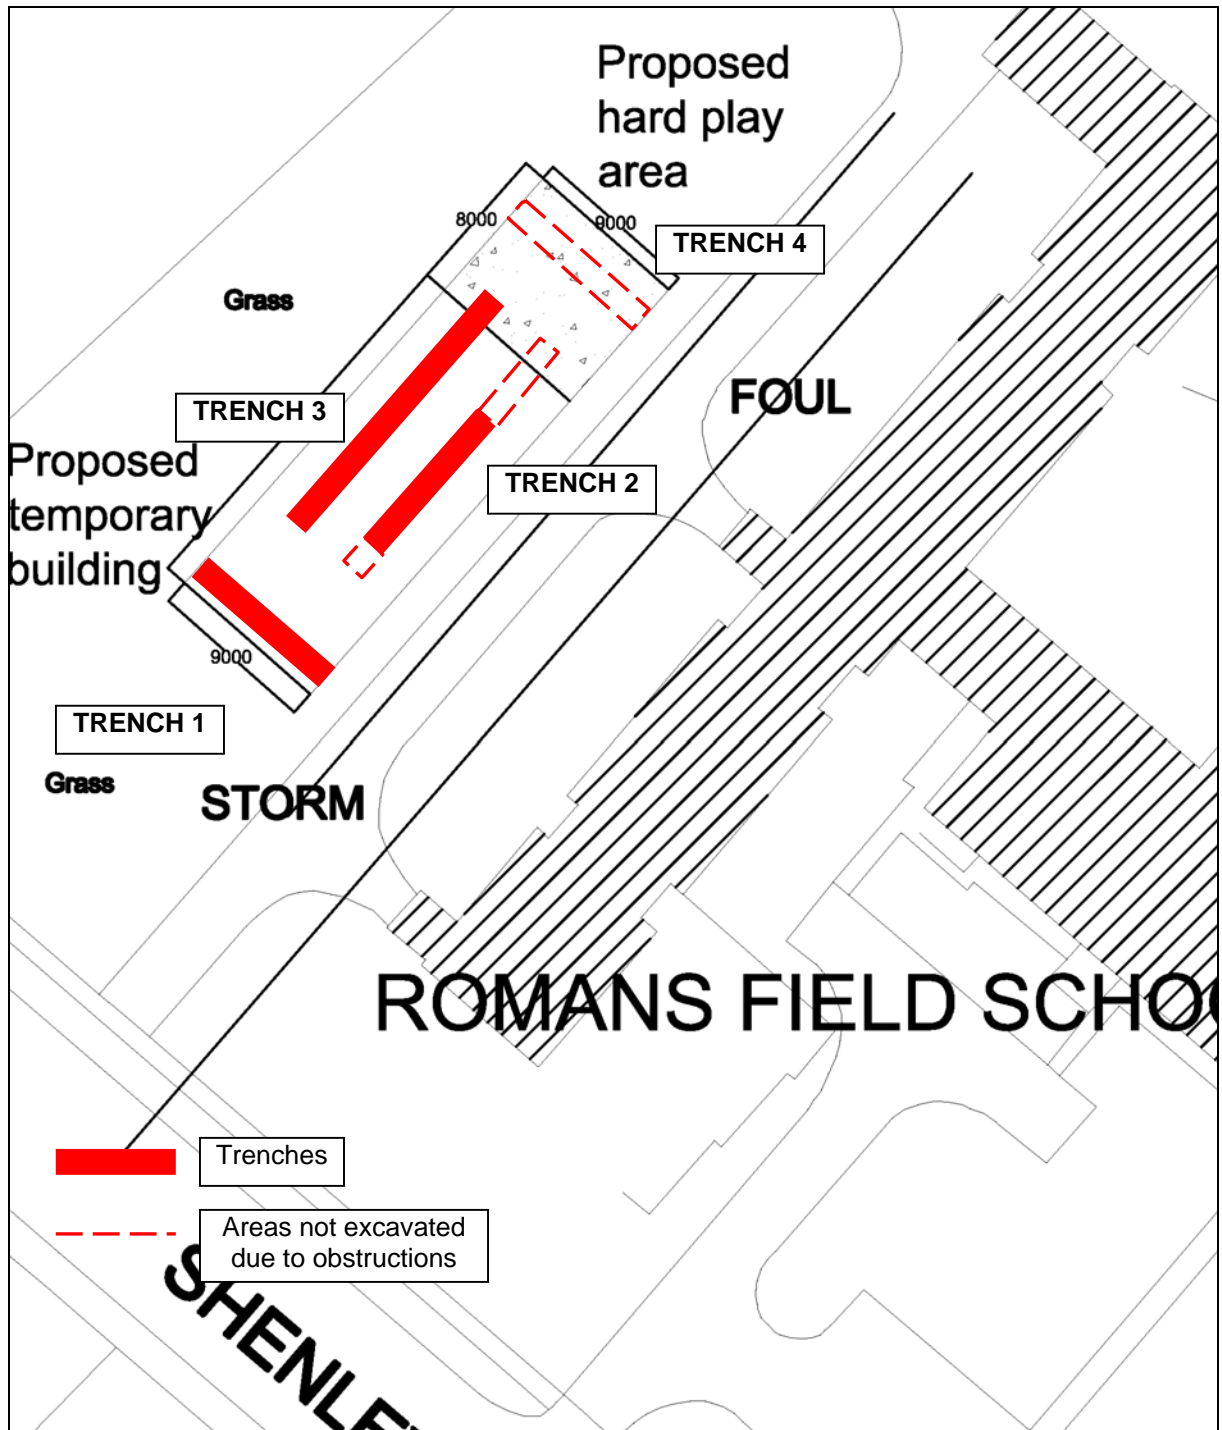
Proposed development Plan with indicative trench locations (scale 1:500)
